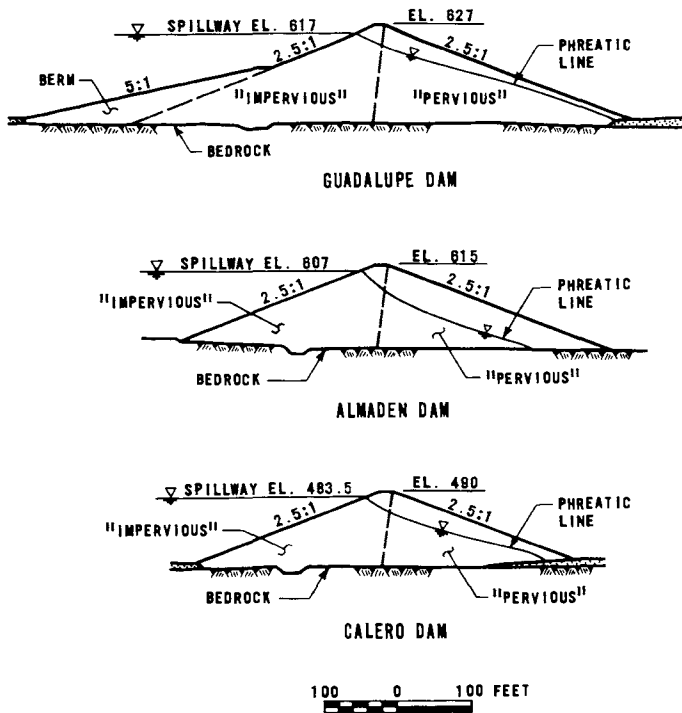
Typical Sections of Guadalupe, Almaden and Calero Dams
